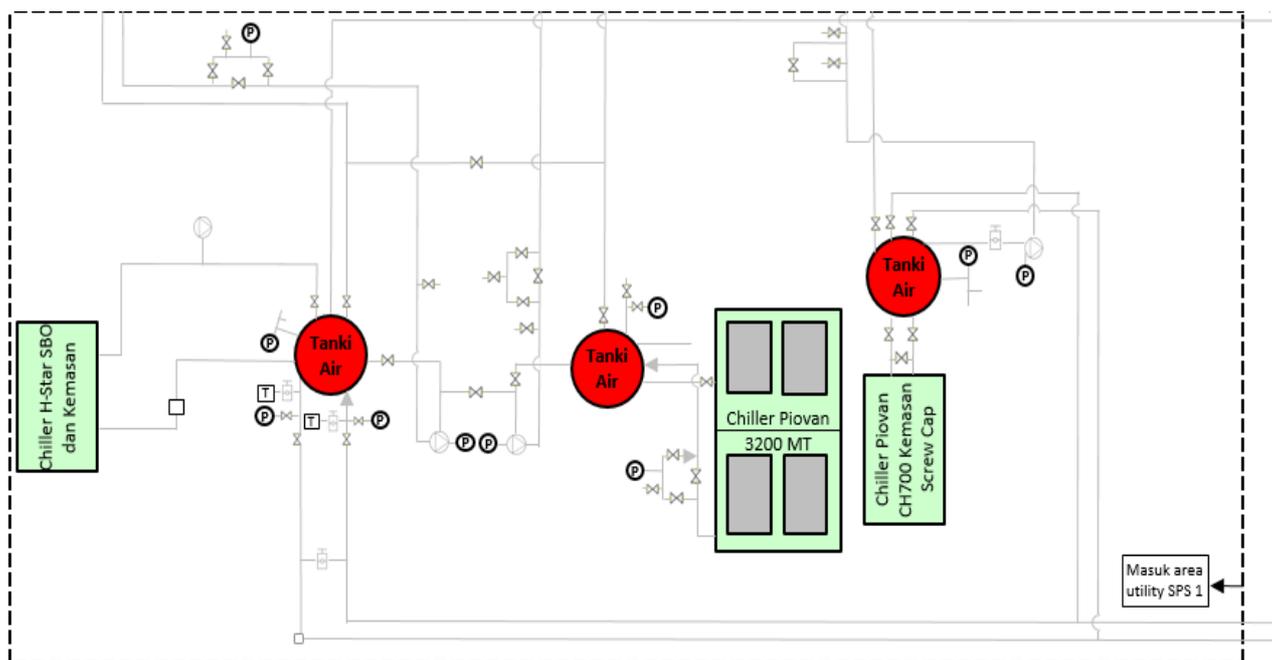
Layout of initial model design SPS 1 manufacturing plant area
